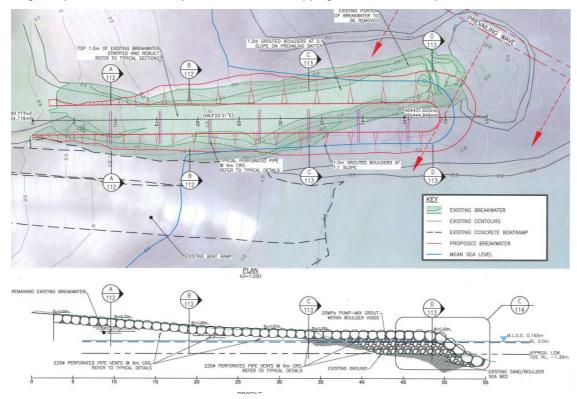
Manu Bay breakwater plan and profile showing locations of cross sections A-D. Supplied by WDC.
